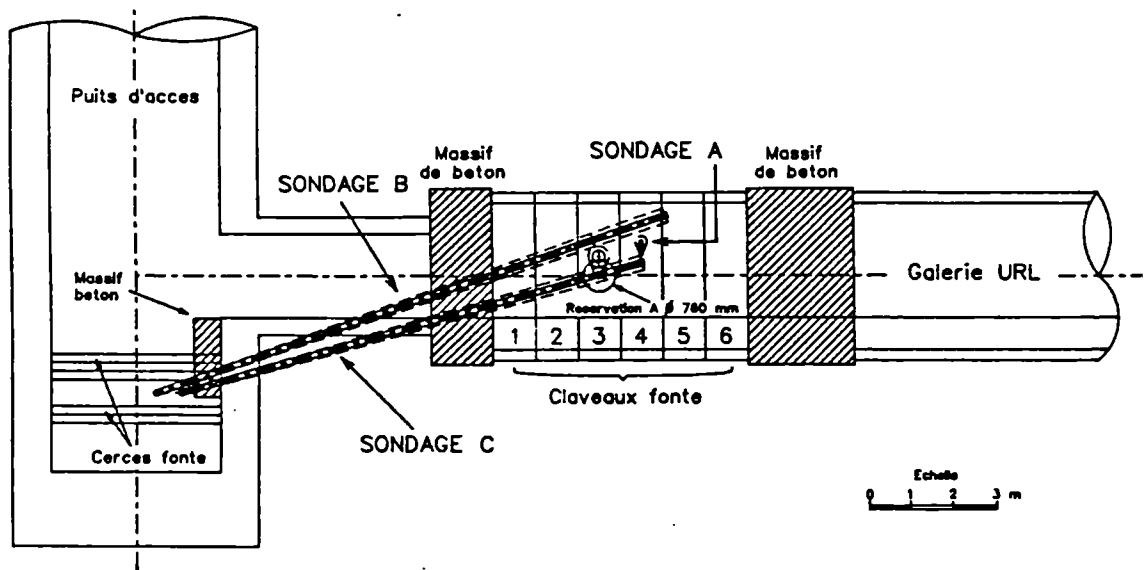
b IN-SITU TEST SITE : VERTICAL CROSS SECTION
